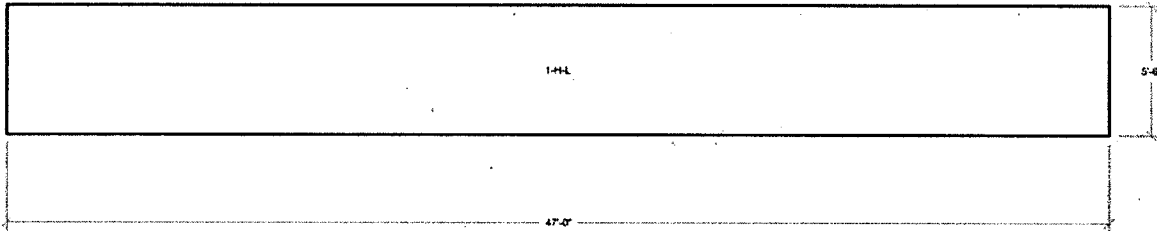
H.7-15: Tunnel and Access Region Basemat Looking Down Horizontal Reinforcement Zones Near Side and Far Side Faces
